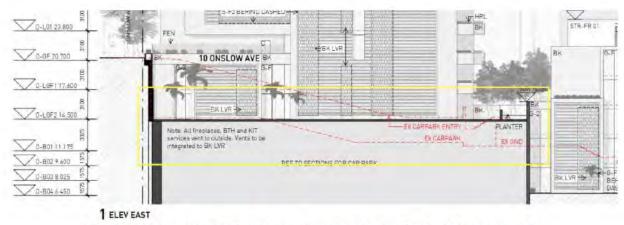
Excerpt of plan labelled elev east, illustrating location of 9.65m high retaining wall.
